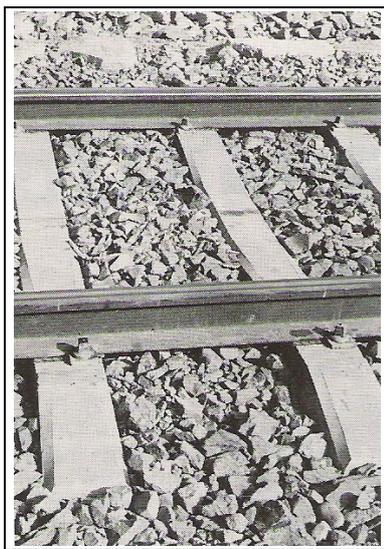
Ties installed since the year 1974 in many areas of the Central Railroad (anchoring by wooden blocks).
